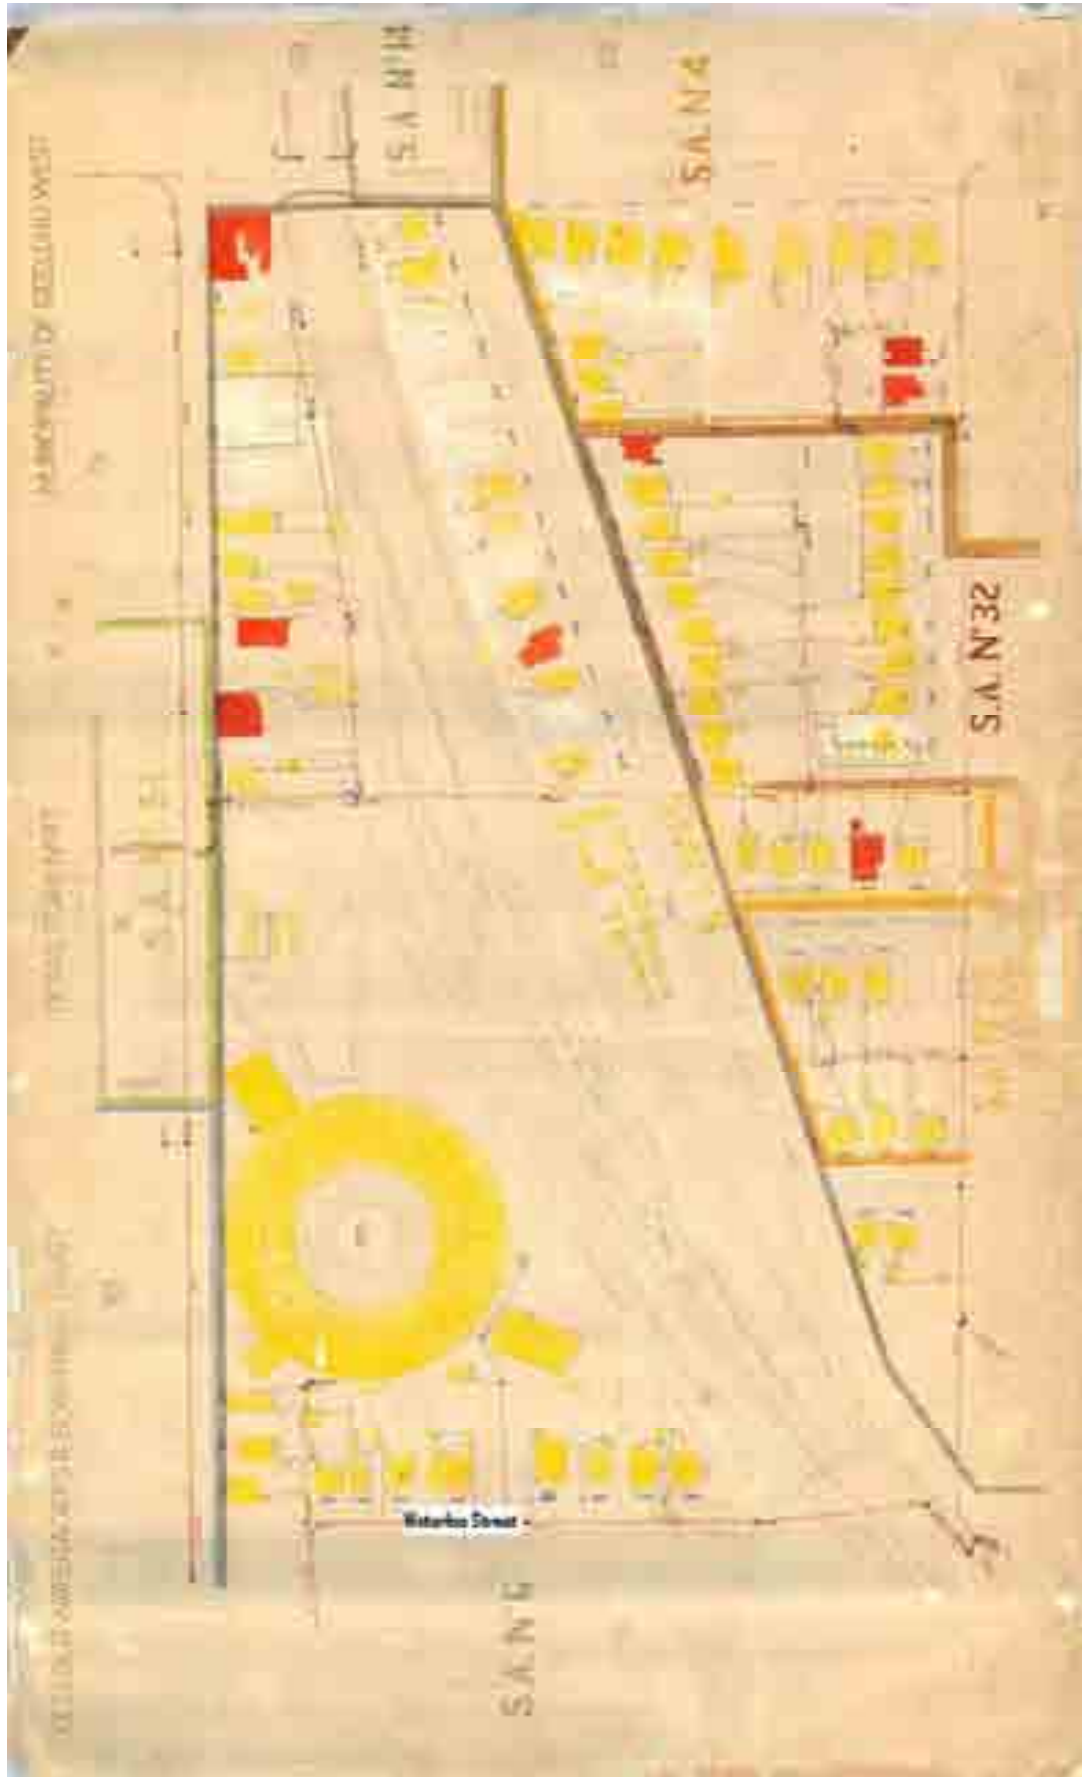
Geelong Waterworks & Sewerage Trust Detail Plan No. 77, 1958. Source: Barwon Water collection.
